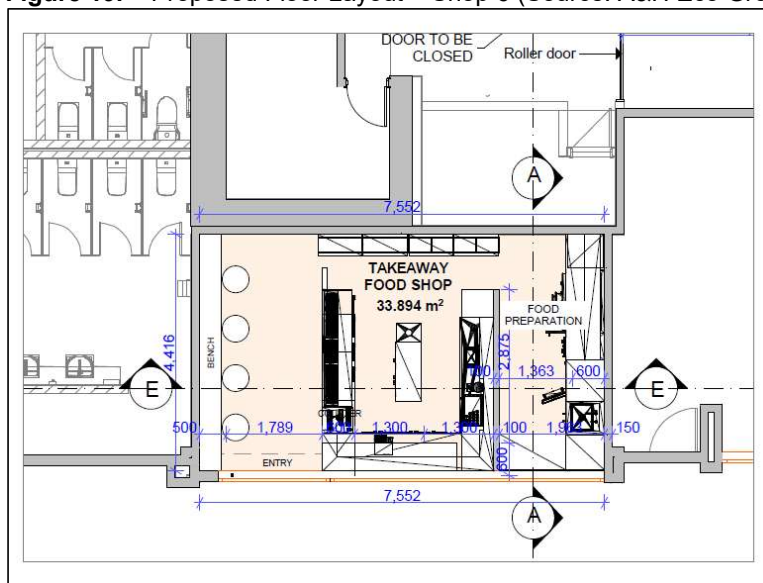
Proposed Floor Layout – Shop 6 (Source: A&H Eco Group)
